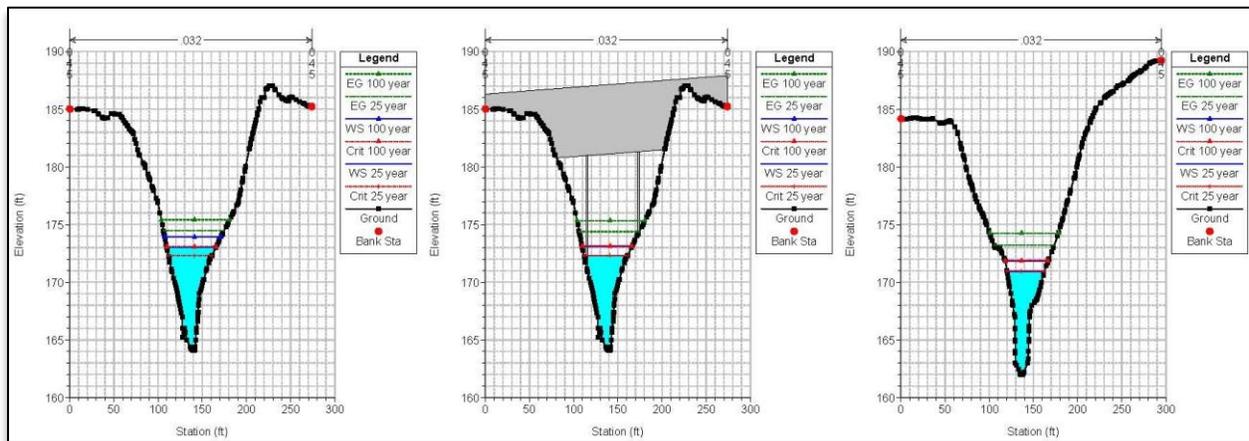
HEC-RAS Upstream, Bridge, and Downstream Cross Sections
